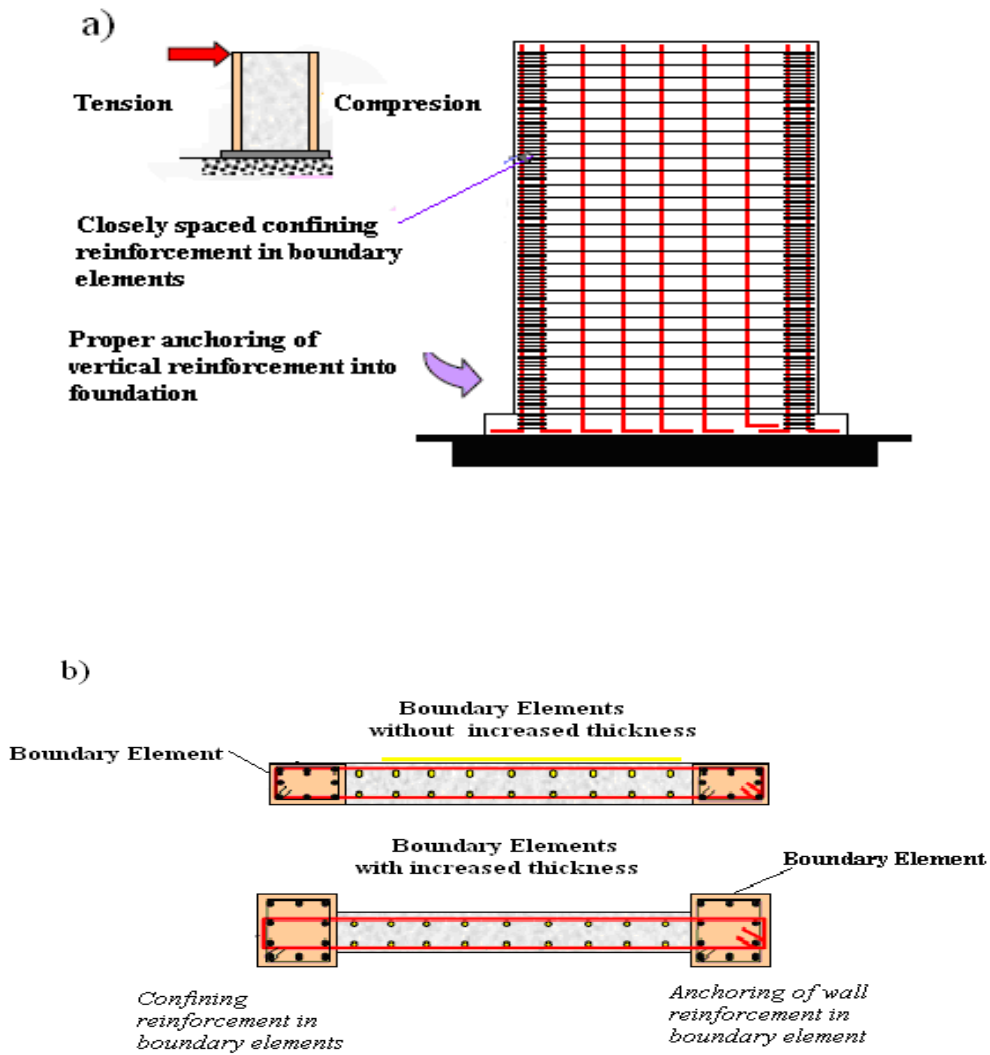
Layout of main reinforcement in Structural Wall (source: Murty 2004)
